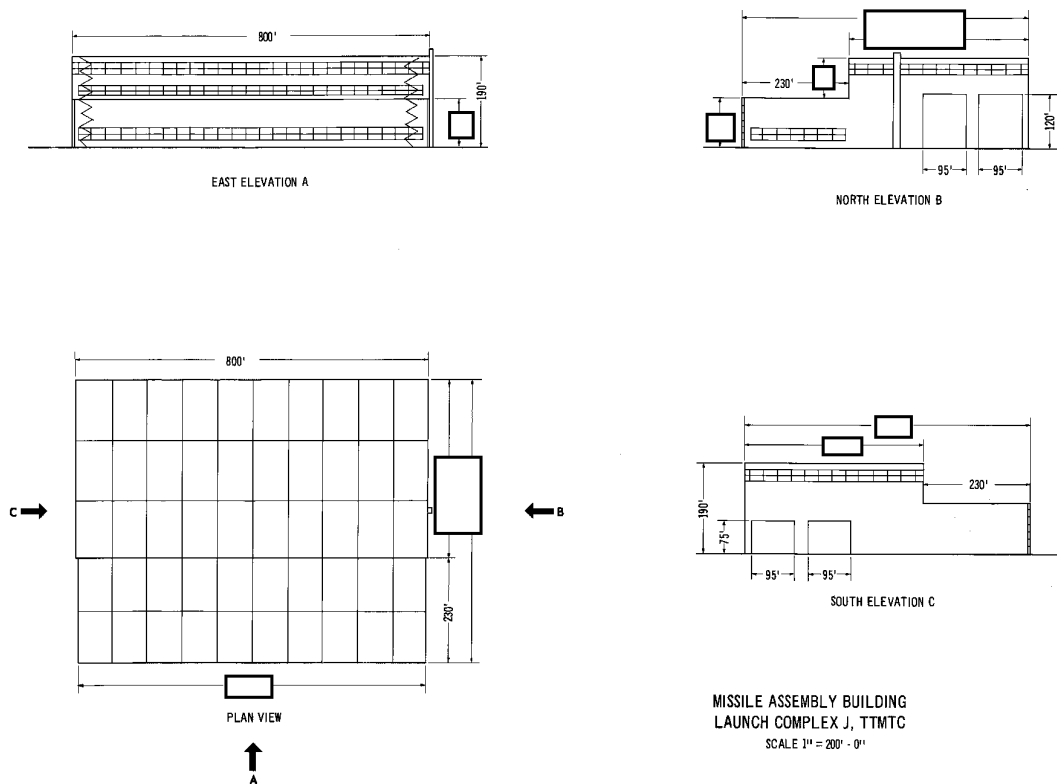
PLAN VIEW AND ELEVATION OF MISSILE ASSEMBLY BUILDING, LAUNCH COMPLEX J.
